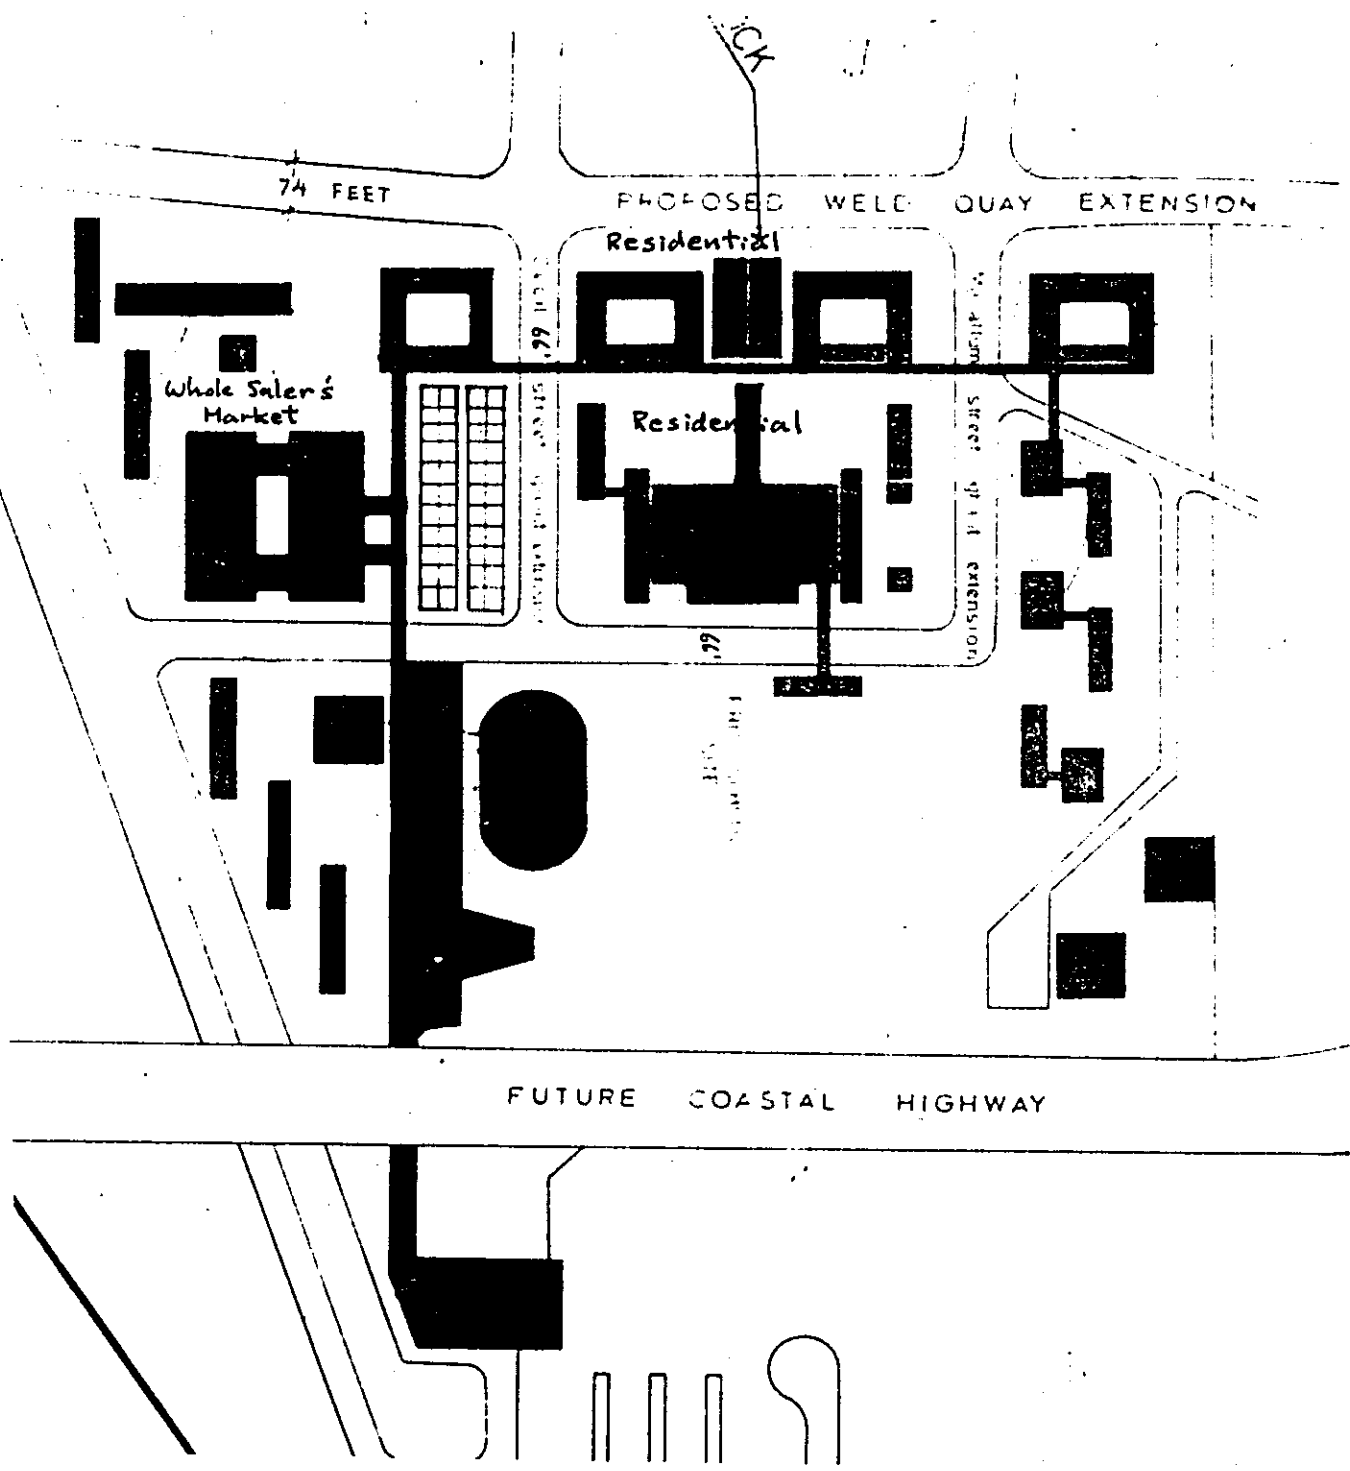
DEVELOPMENT PLAN BY P.D.C
